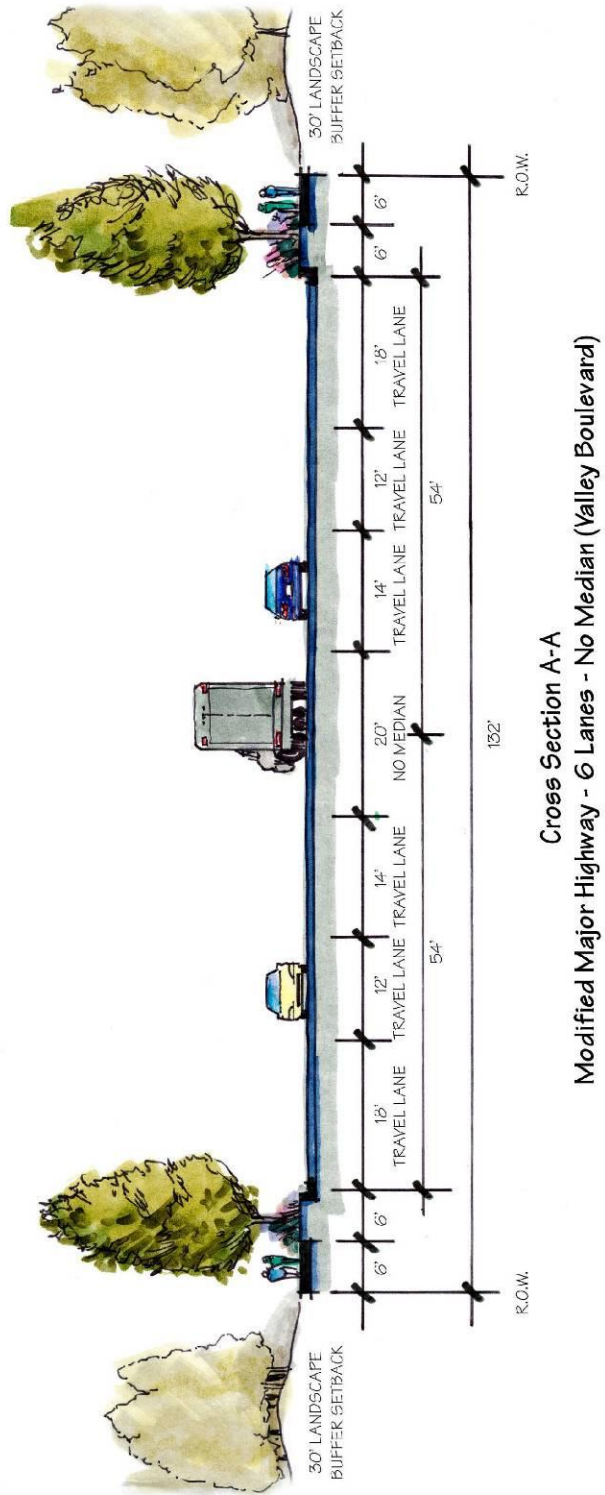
Modified Major Highway – 6 Lanes – Cross-Section A-A (Valley Boulevard)
